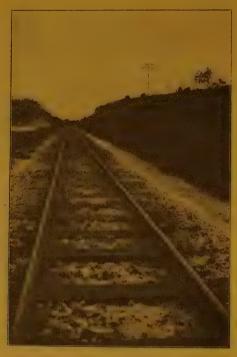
T. P. 325/20 main line between Tebong and Tampin, 60 lb. O. S. rails, 36 inch 6 bolt angle plates. Note kigk in left hand rail at joint due to joint sleepers not being properly adzed, square joints.
